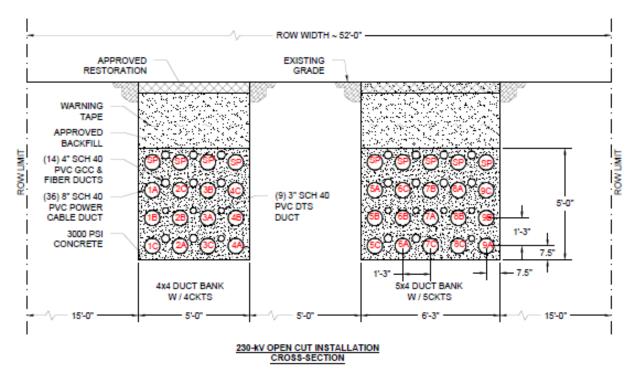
Underground Duct Banks in Underground Onshore Export Cable
